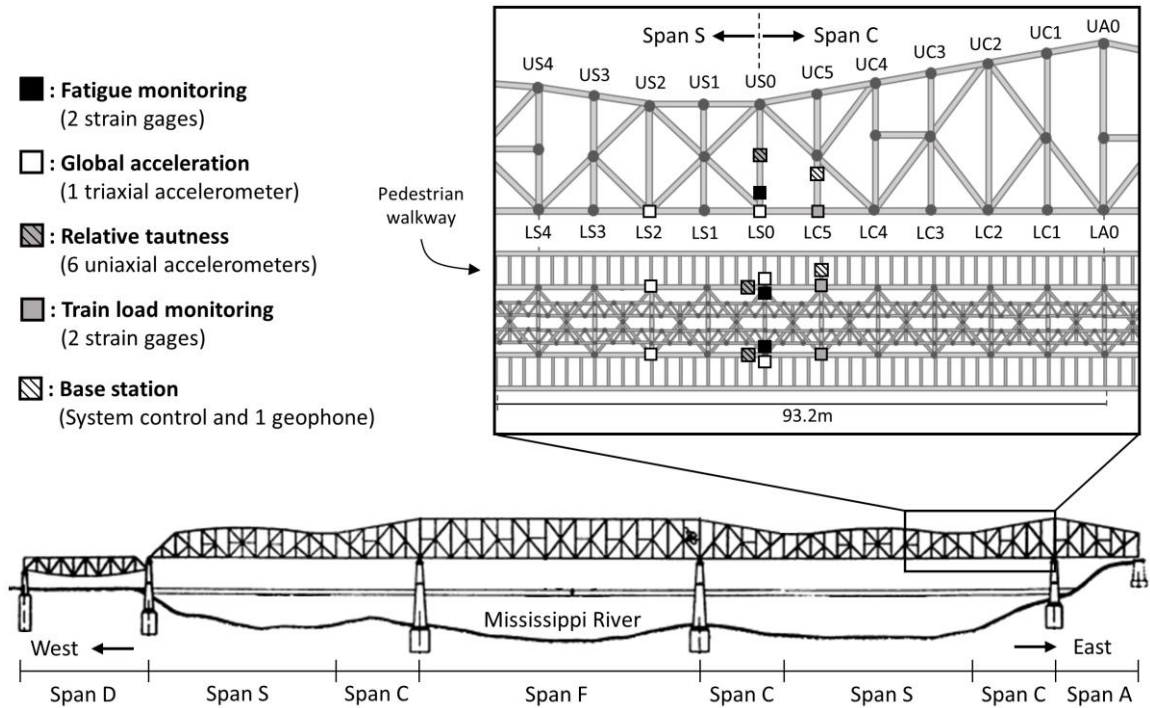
Span design and instrumentation plan for the long-term monitoring system installed on the Harahan Bridge (Memphis, TN).
